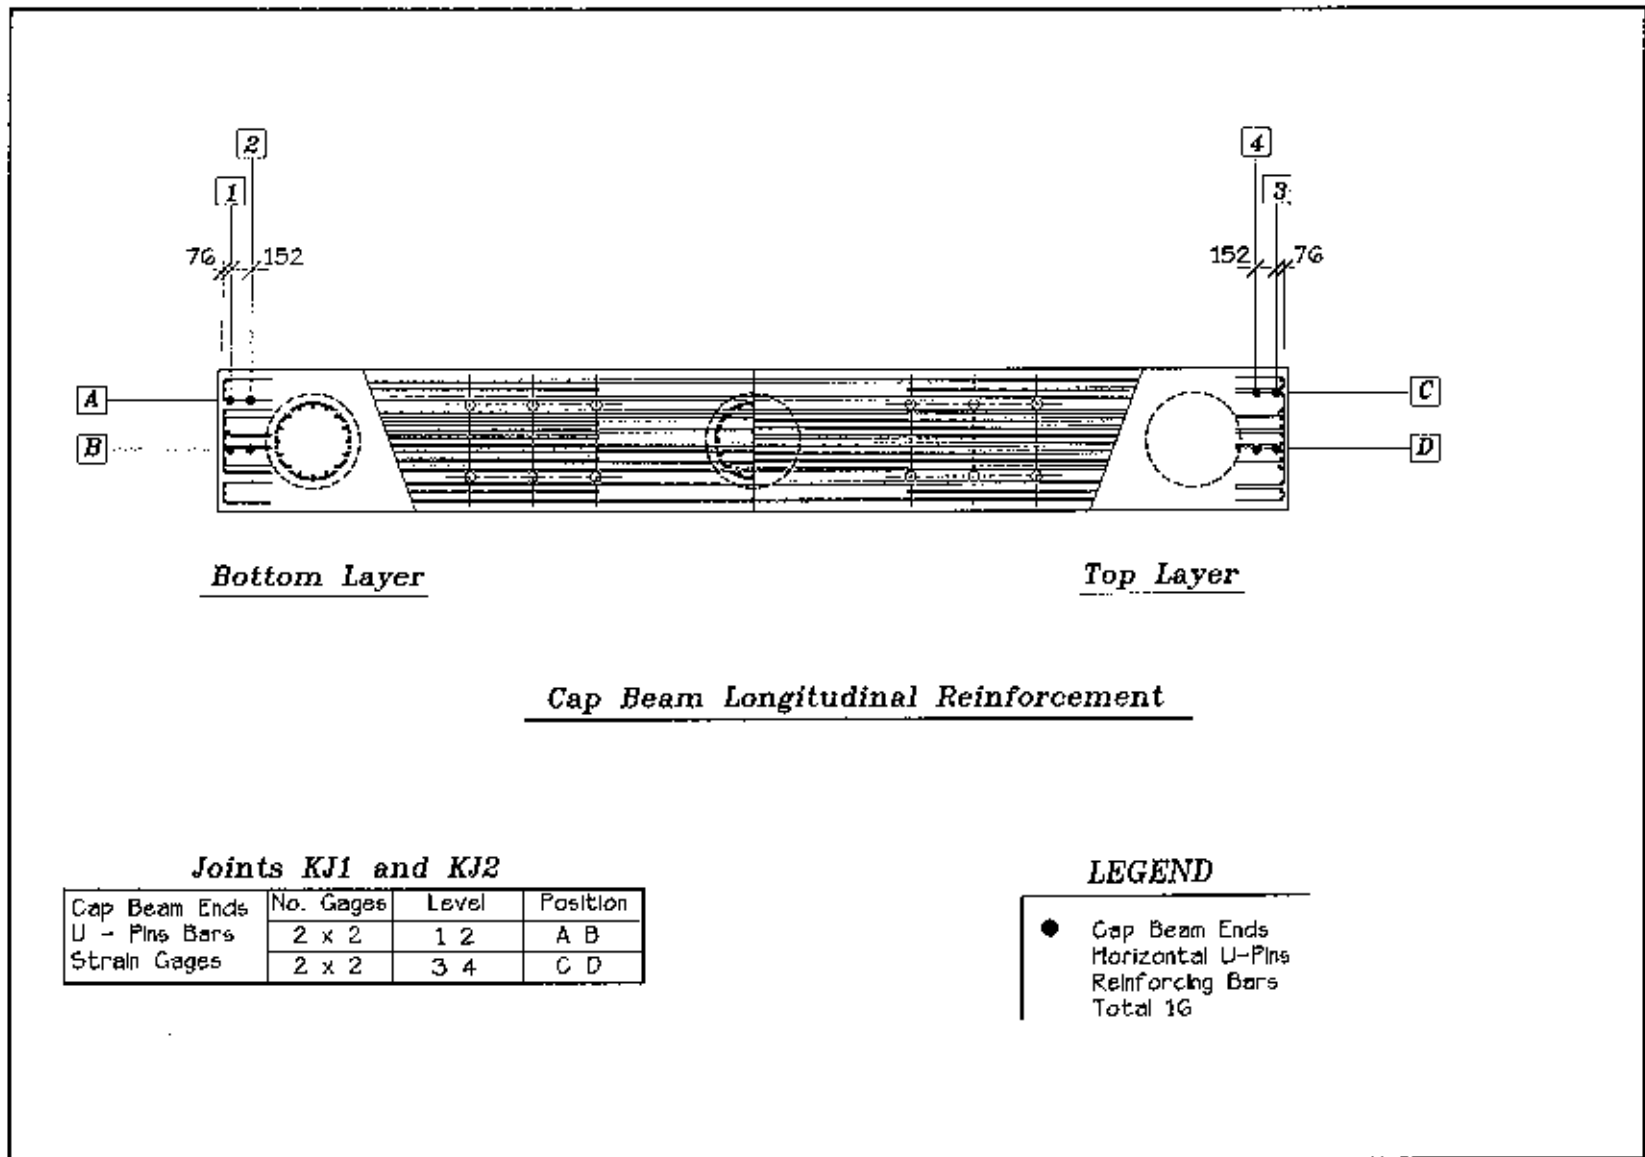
Cap Beam Ends Horizontal U-Pins Reinforcing Bars Strain Gage Layout
